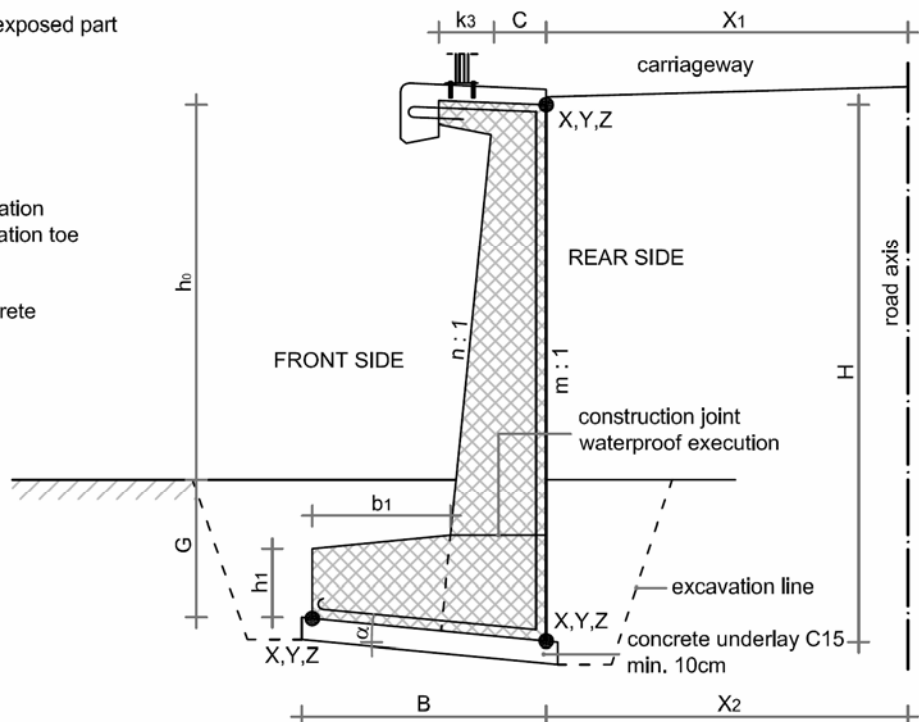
Simple reinforced concrete gravity supporting wall, including staking out data
